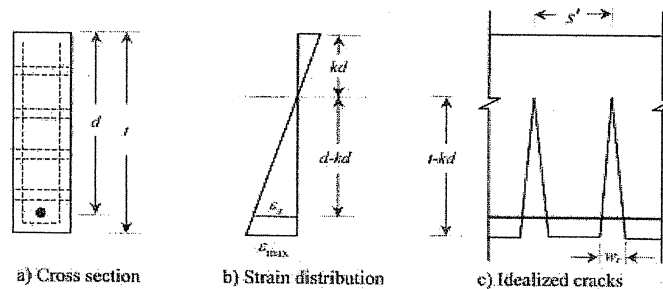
Flexural Cracking of a Masonry Beam
